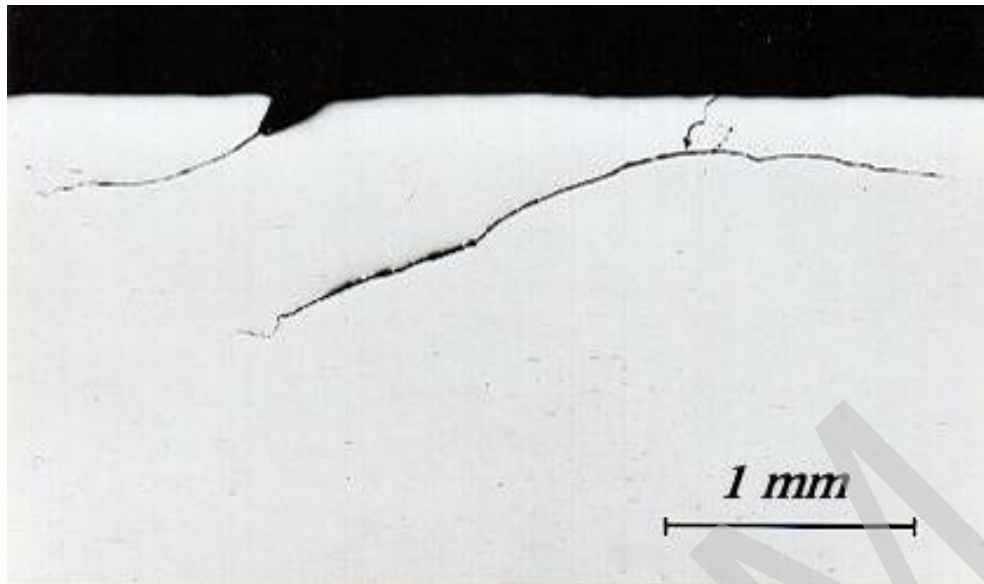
(b) Longitudinal section of a rail showing the initial stages of development of checking cracks and spalls. Note how the crack initially grows into the rail head but then levels out.
